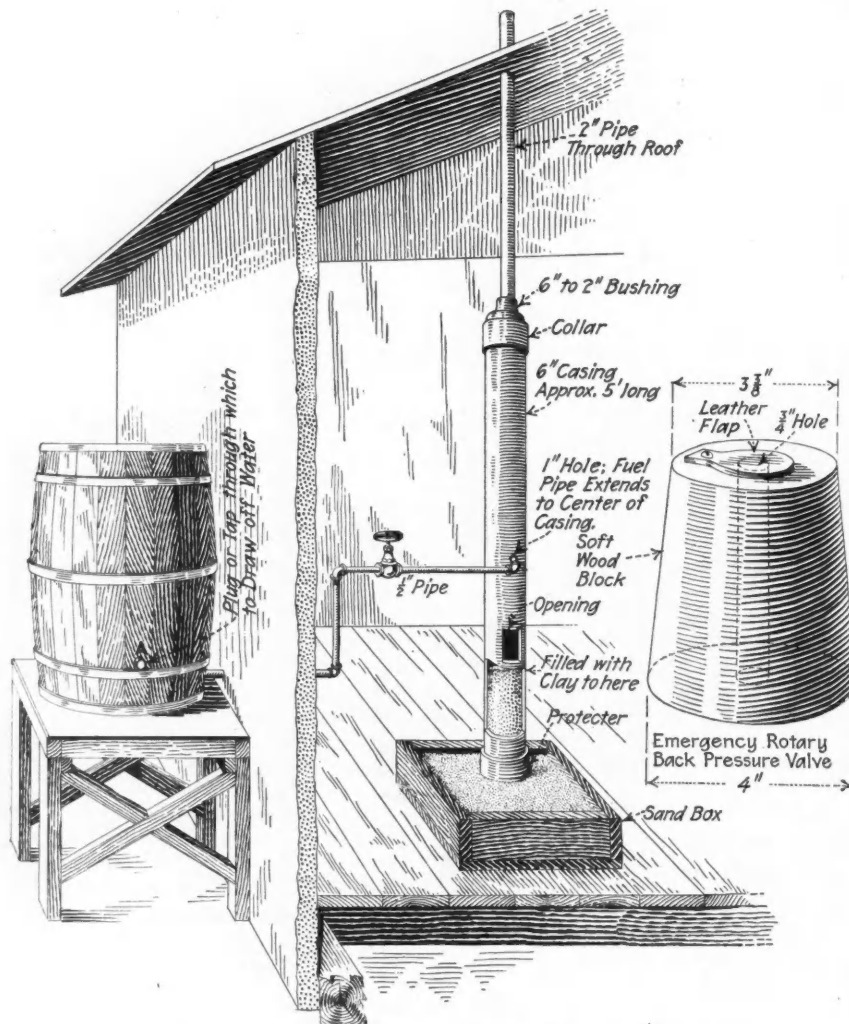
FUEL-OIL STOVE AND BACK-PRESSURE VALVE
